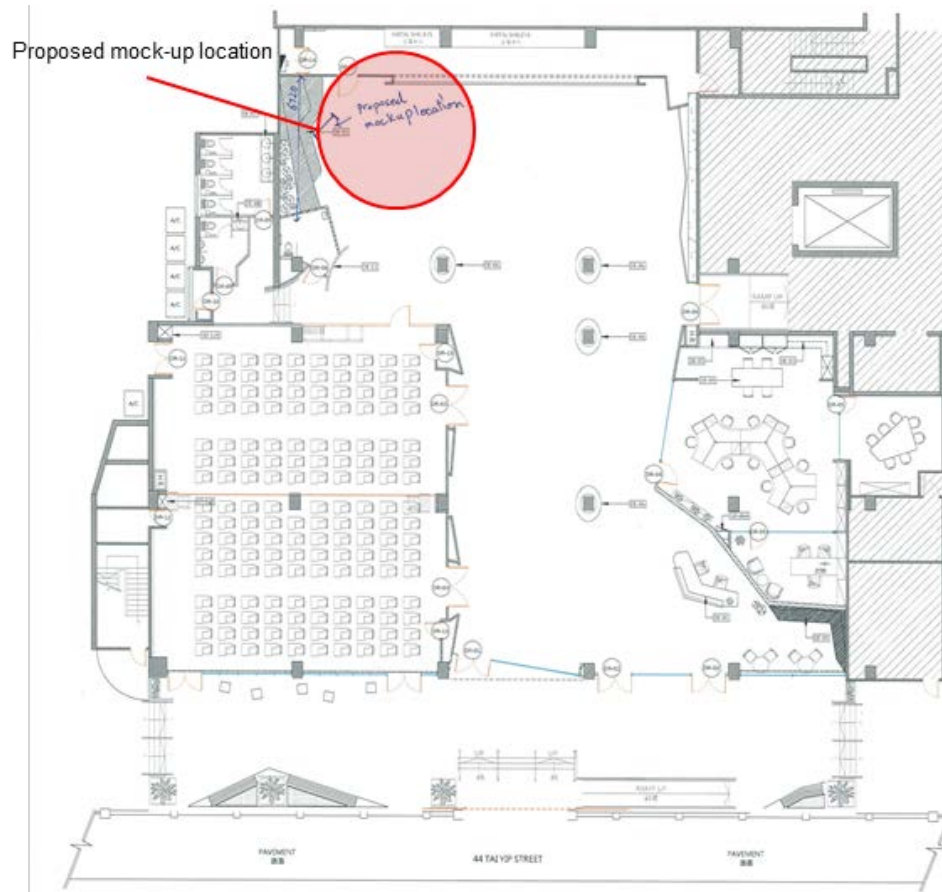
Floor plan of CITAC with mock-up display location indicated
